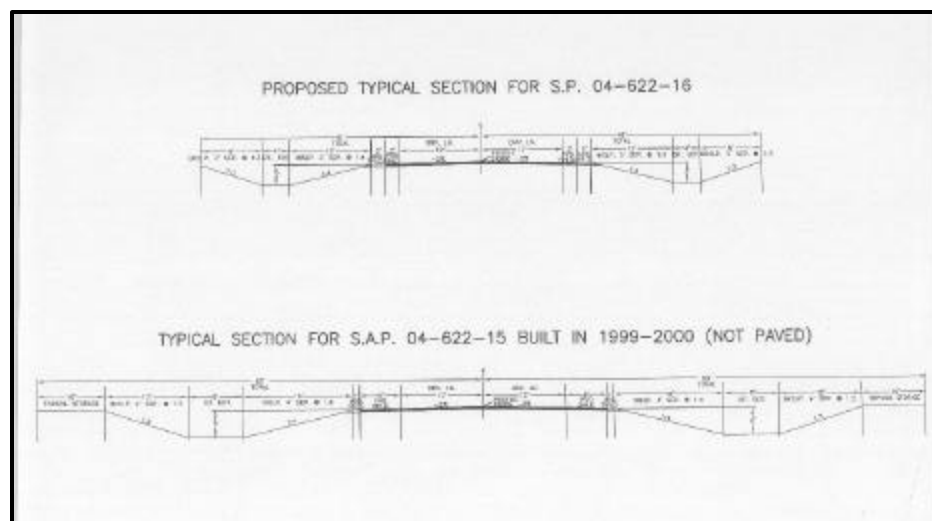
Typical Section of Proposed Alternative B Compared with Existing Improved Section of CSAH-22.
